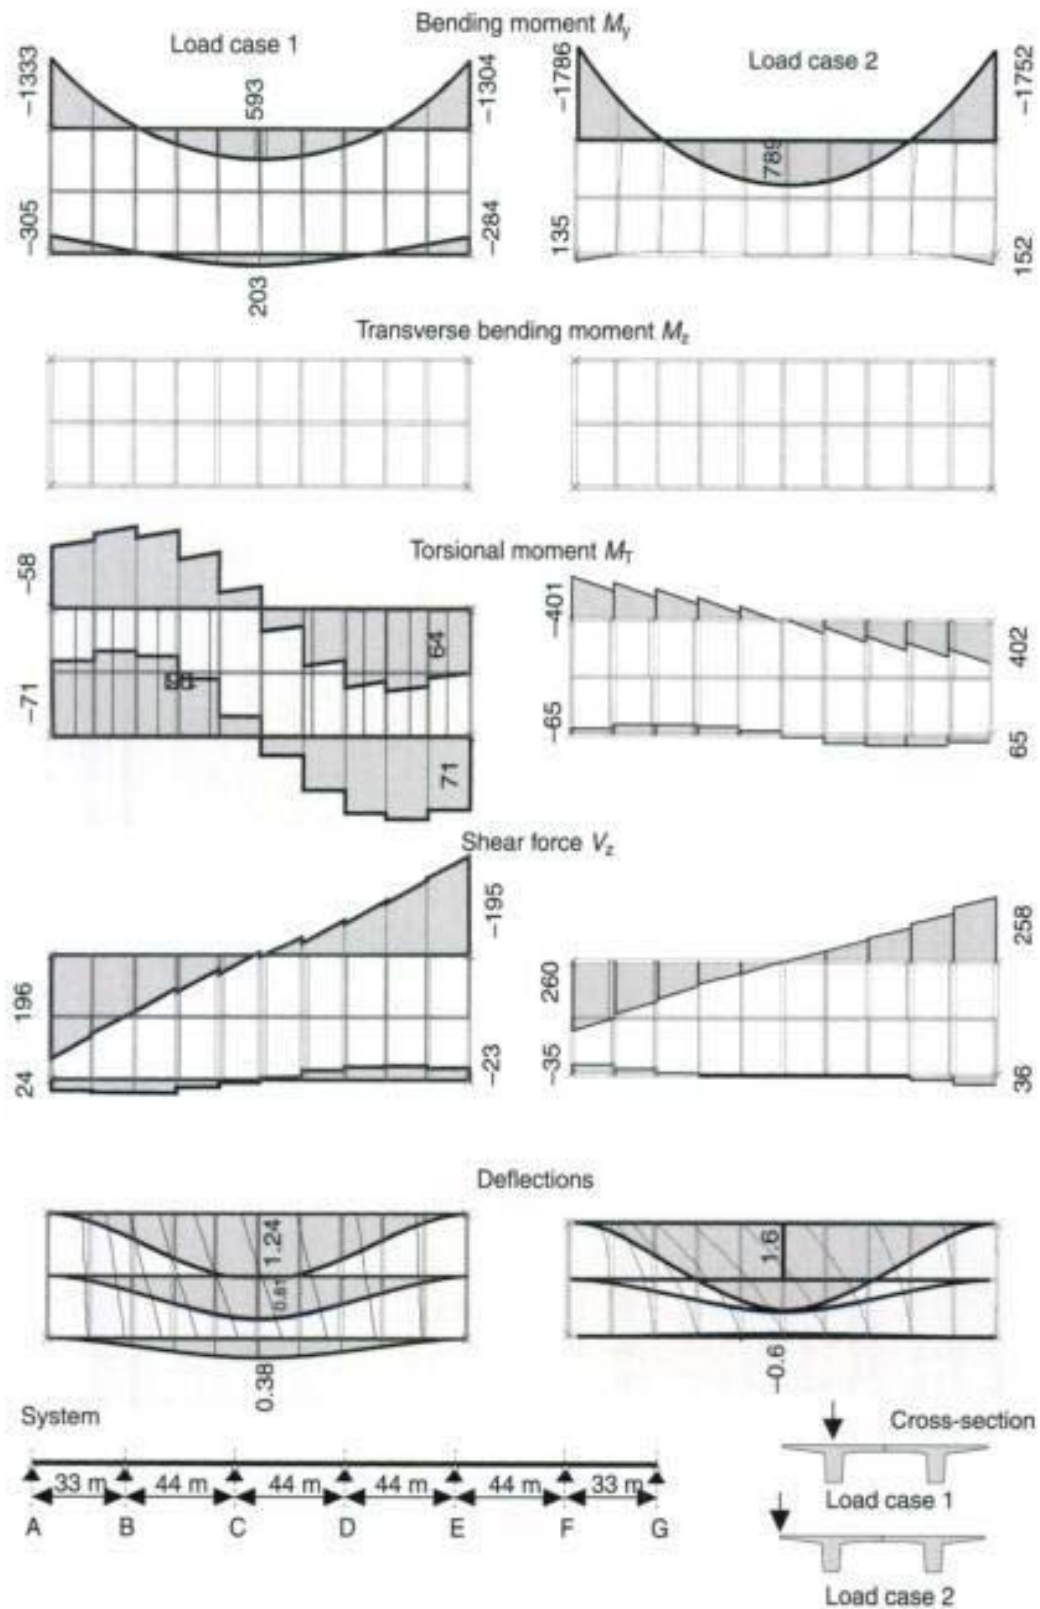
Member forces and deflections of span C-D – two-dimensional truss system
